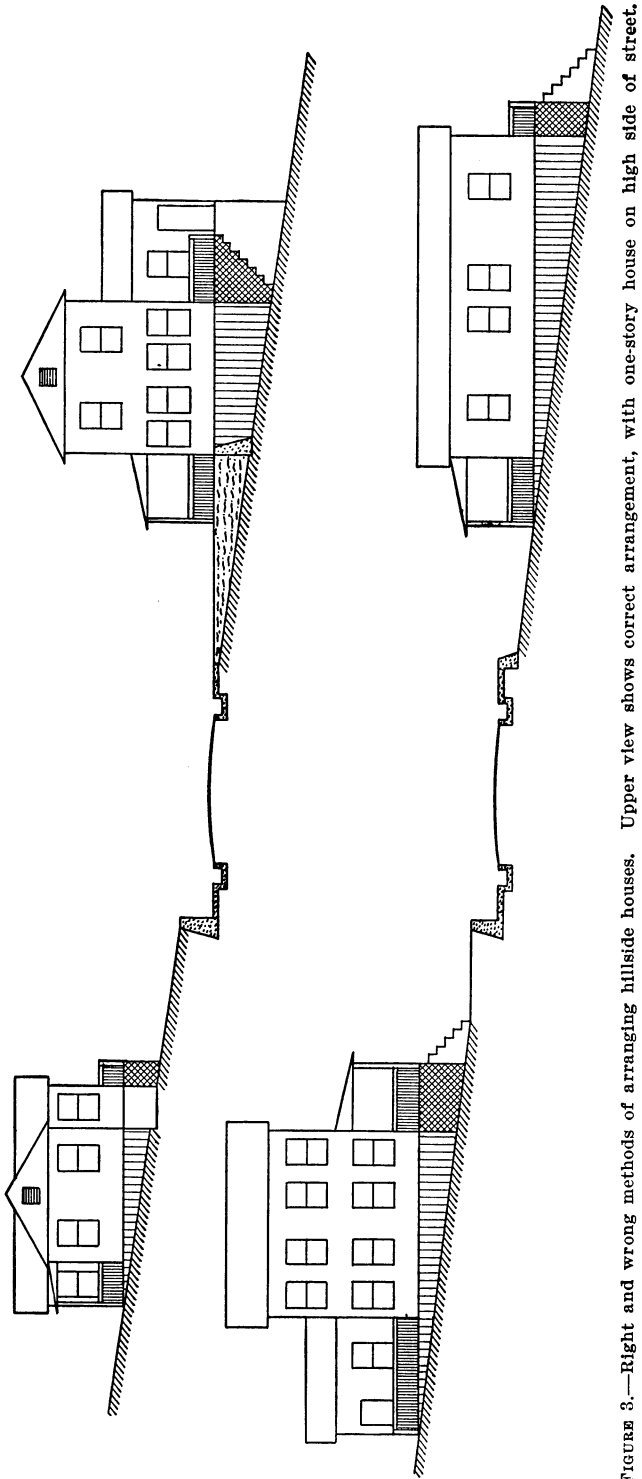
Right and wrong methods of arranging hillside houses. Upper view shows correct arrangement, with one-story house on high side of street.
